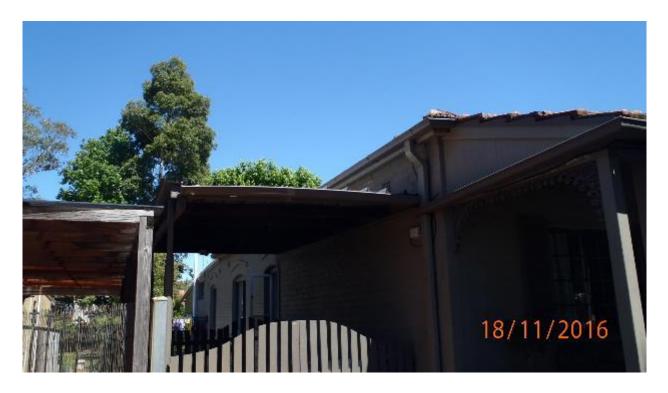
shows step cracking to the front verandah wall above the Bedroom 1 window.
